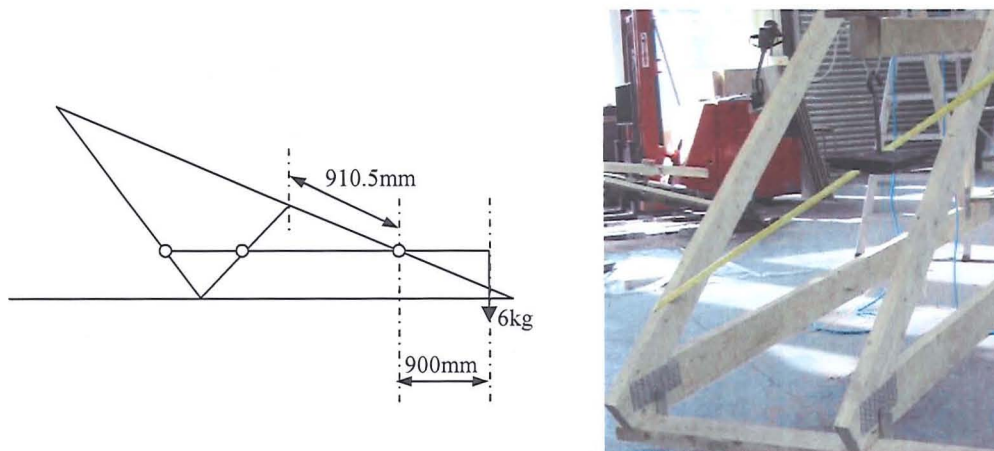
Eccentric load (attached to the second truss in from the left hand side).
